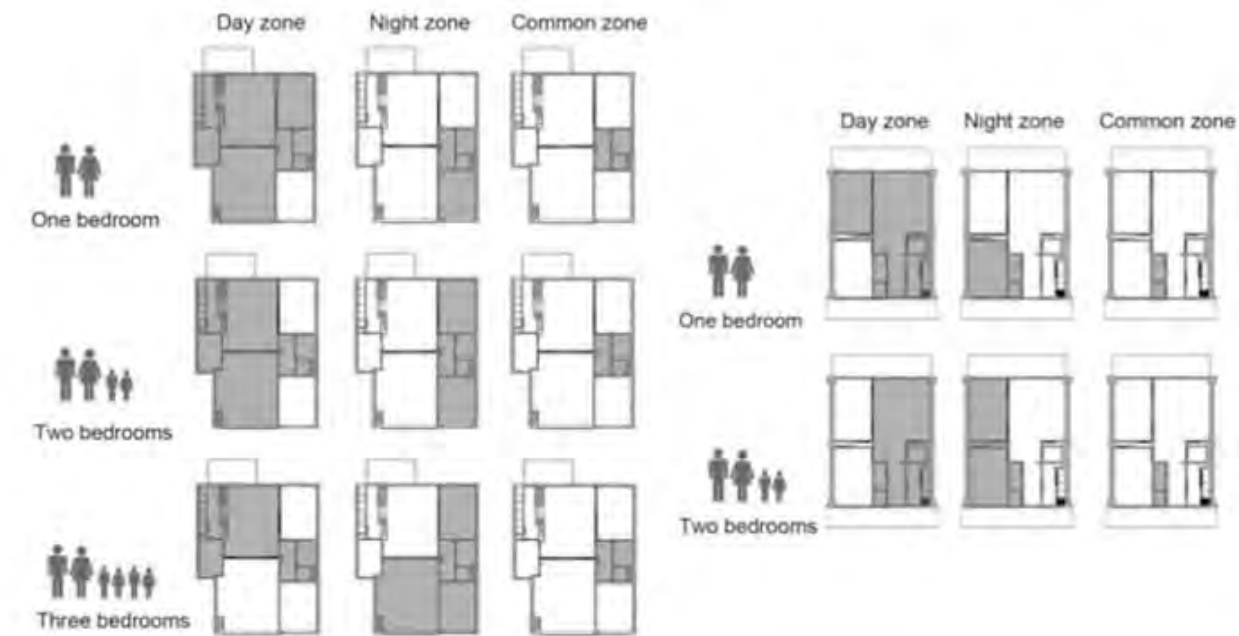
Illustration of a flexible, loose fit dwelling, showing how the house might be adapted to suit different demographic circumstances (image source: planningtank.com)
